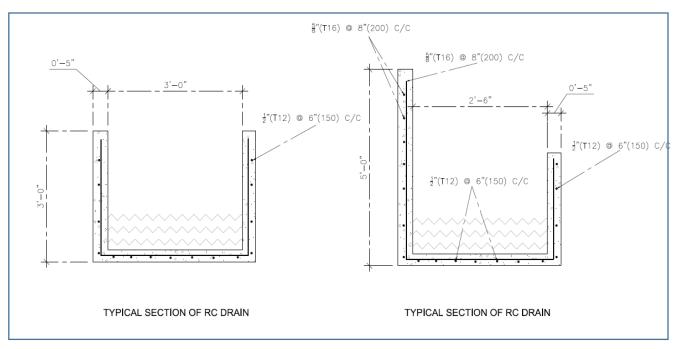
Cross Sectional Design of the Reinforced Concrete Drains
